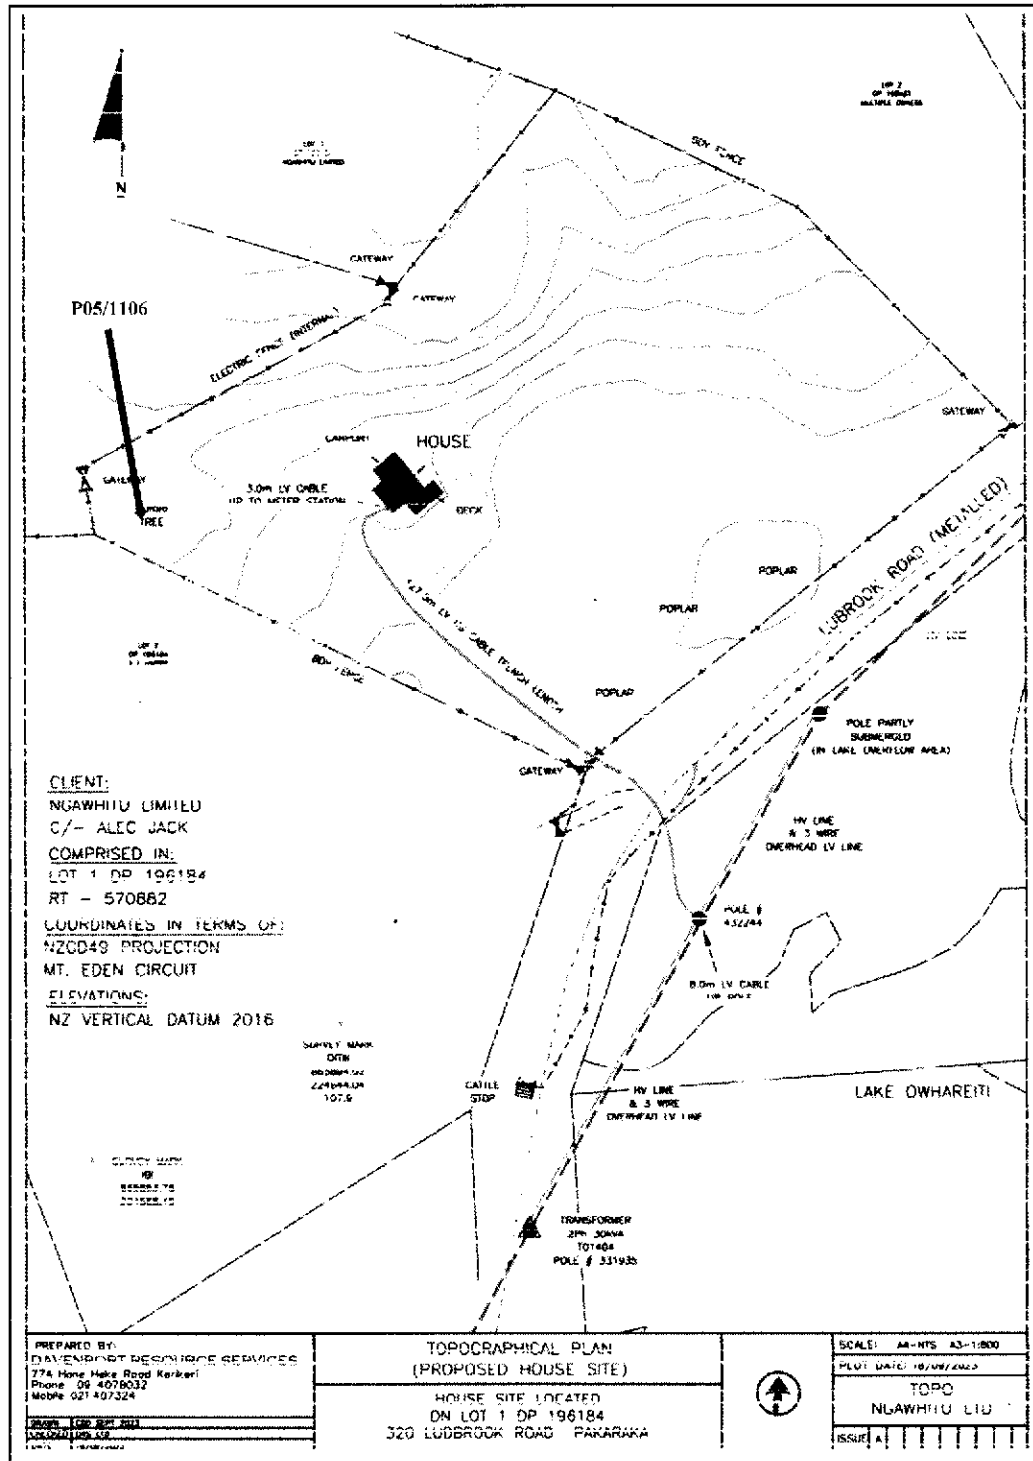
Location and layout plan of the development (Davenport Resource Services 2023).
